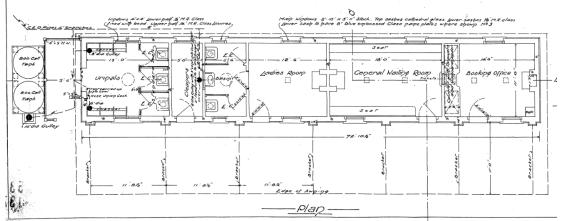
Image of the Platform 1 building layout, c1910. Source: Sydney Trains Plans Room
